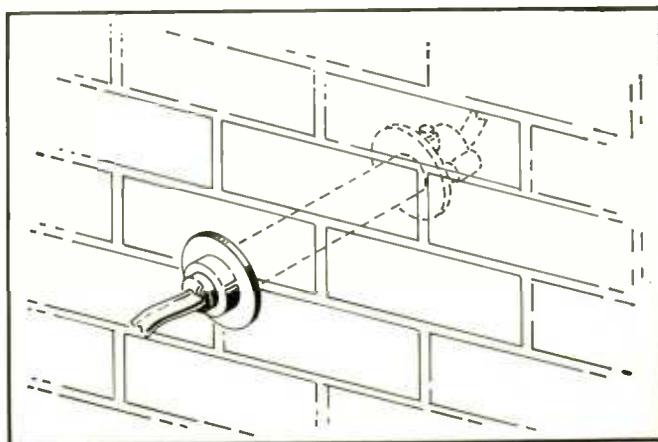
You'll find that a wall feedthrough insulator is needed with twin-lead to protect and secure the body of the lead-in.
